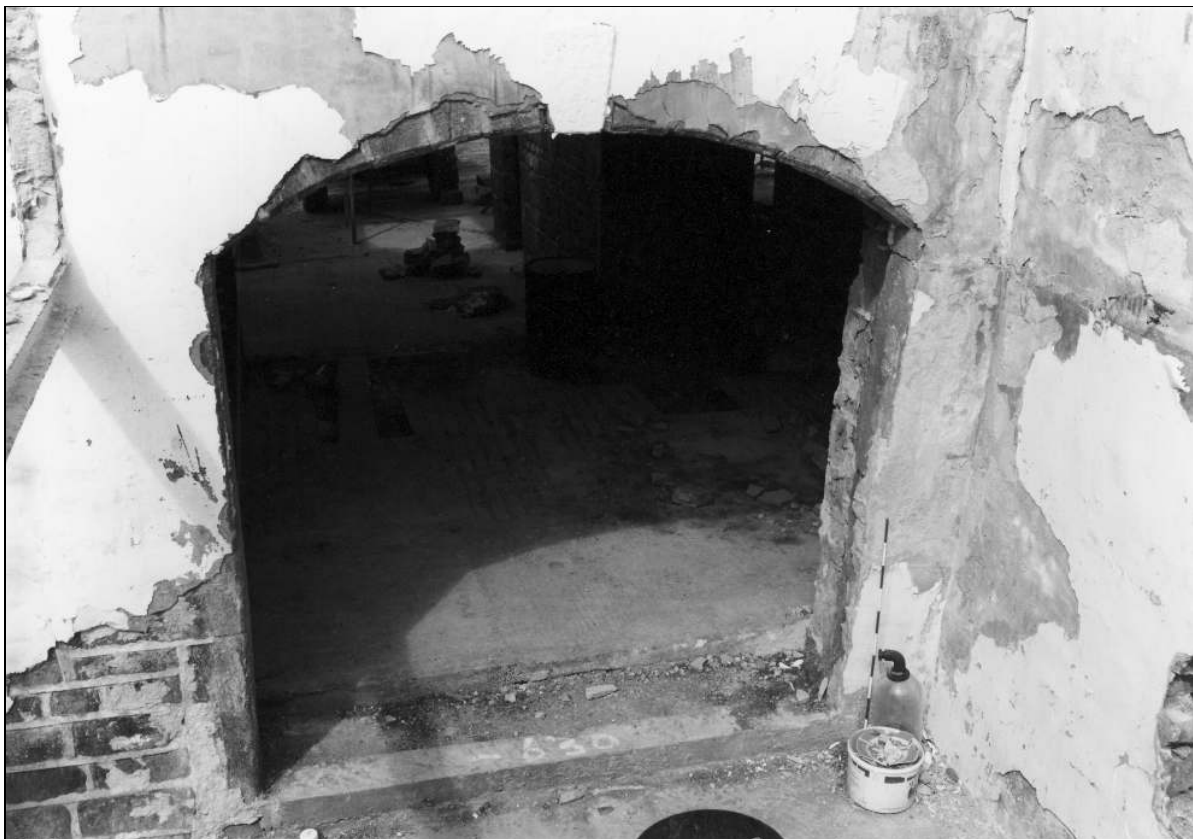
Arched doorway in south-east elevation of barn, after unblocking (film 6, frame 9)
